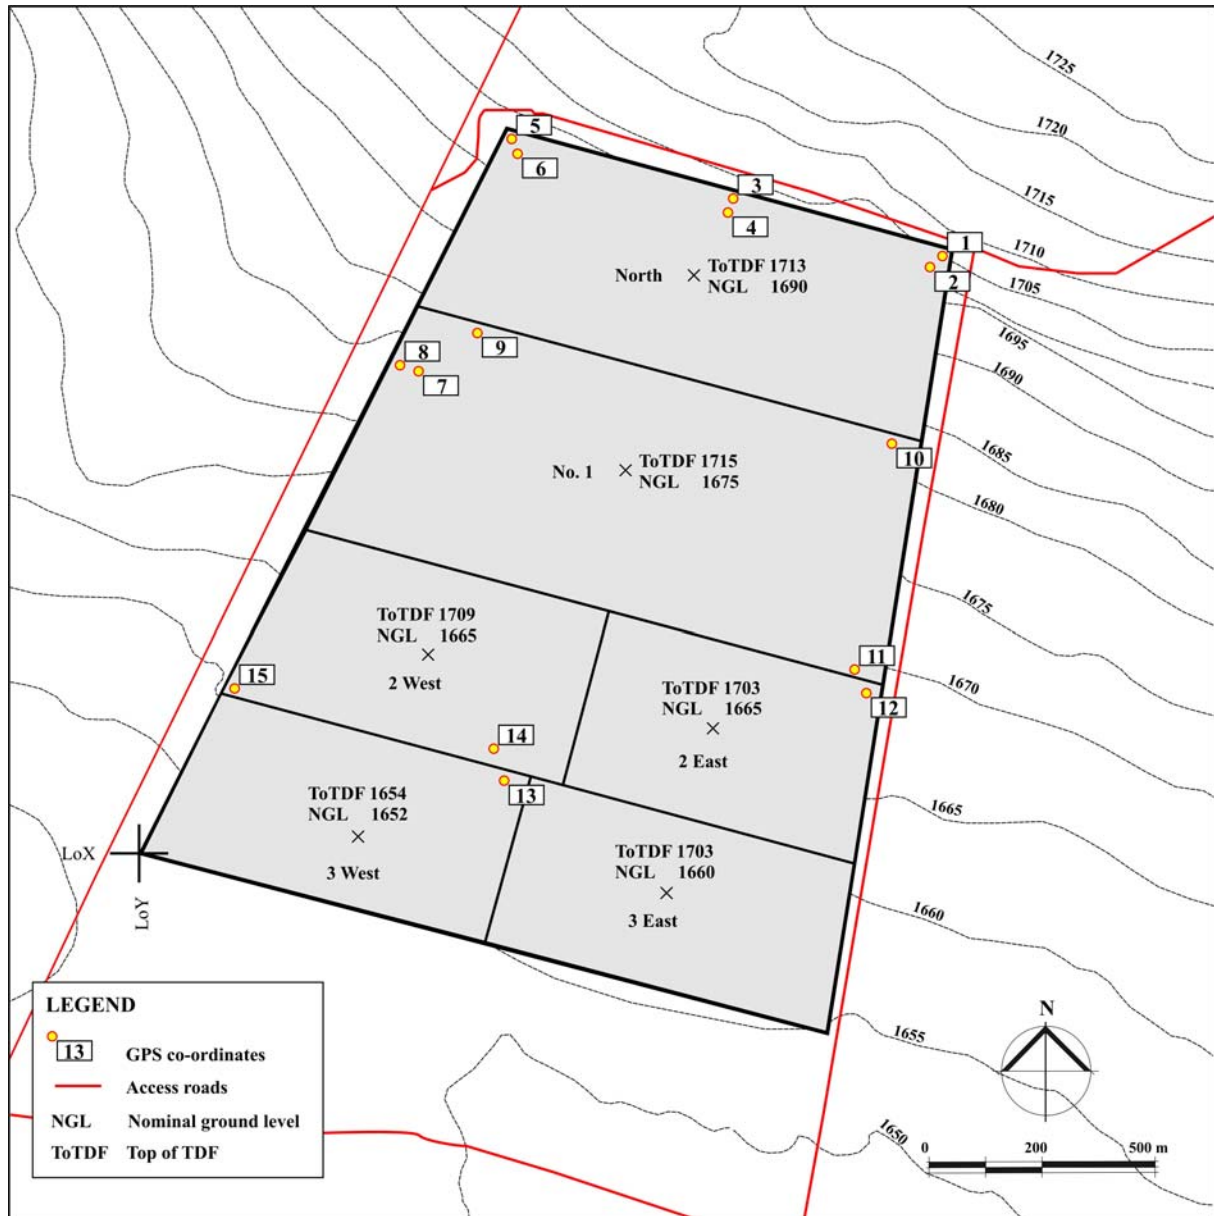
DRD 2L24 layout plan indicating the sampling points.
